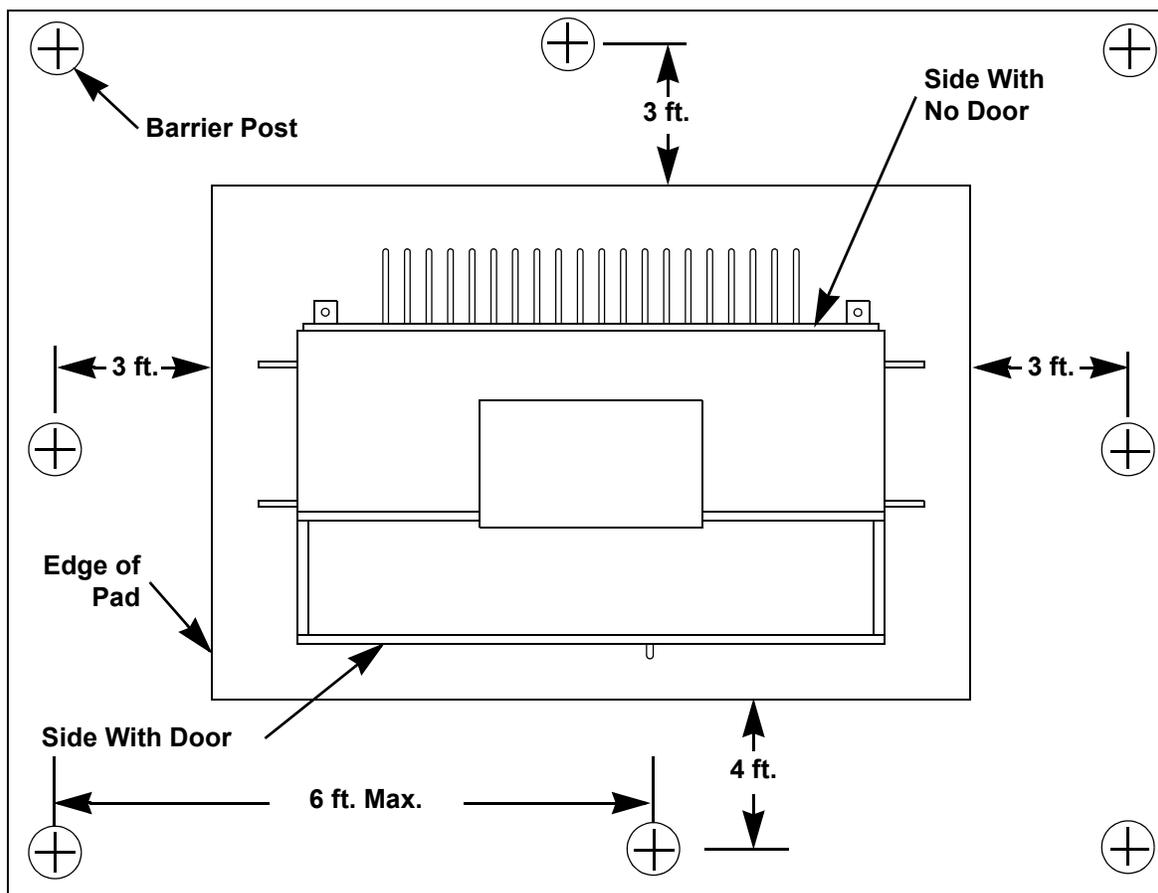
Top View of Barrier Post Locations at a Pad-Mounted Installation
